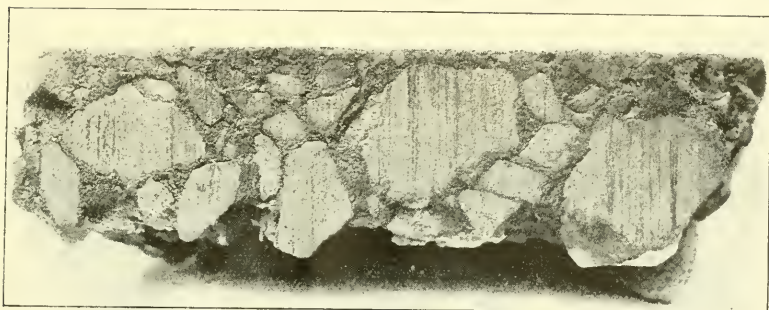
SEC. 12B.—BITUMINOUS PAVEMENT, BUILT BY PENETRATION METHOD. SAME CONSTRUCTION AS SEC. 12A, EXCEPT THAT SANFORD AND STRAINS ASPHALT BINDER WAS USED.
